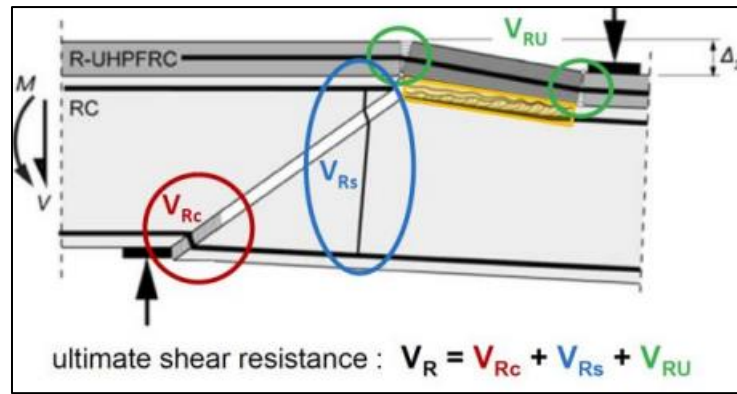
Shear failure mechanism of bridge deck overlaid with R-UHPC
